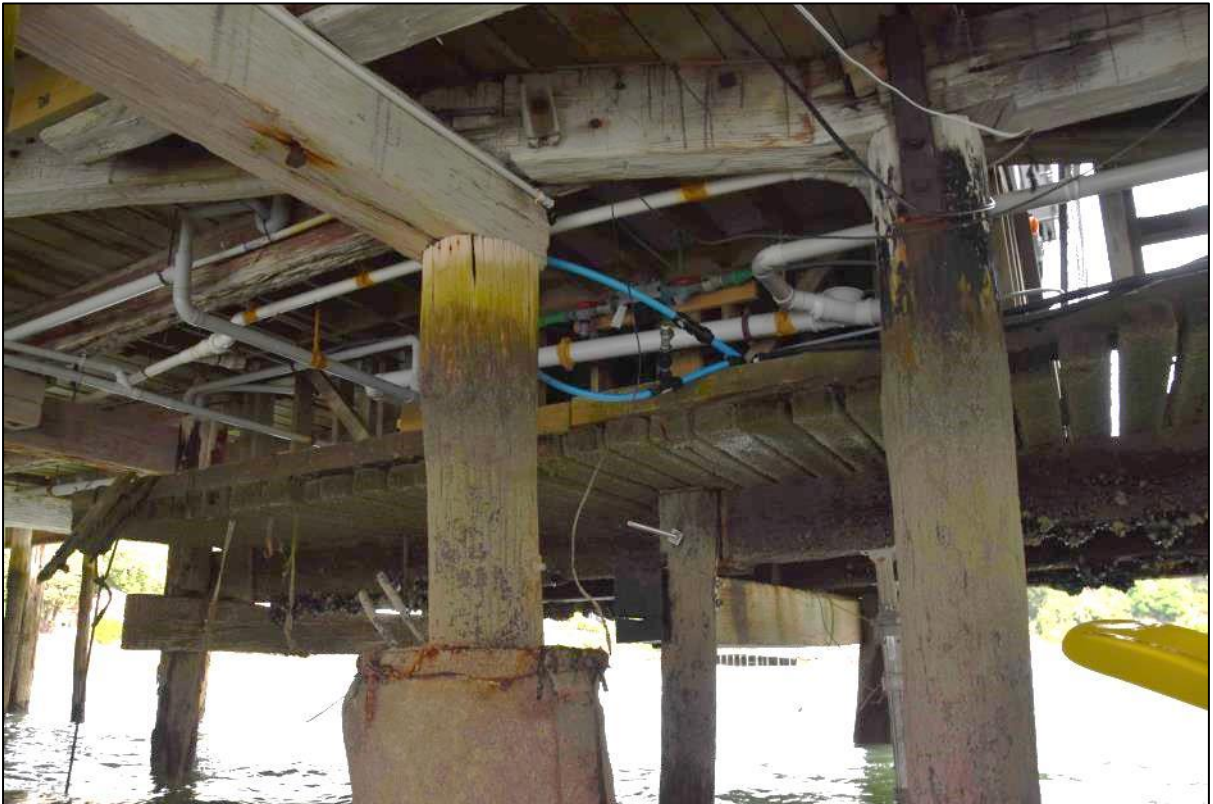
Tanks and modern piping on the lower deck area on the south side of the wharf (refer to Photos 21 & 22).
